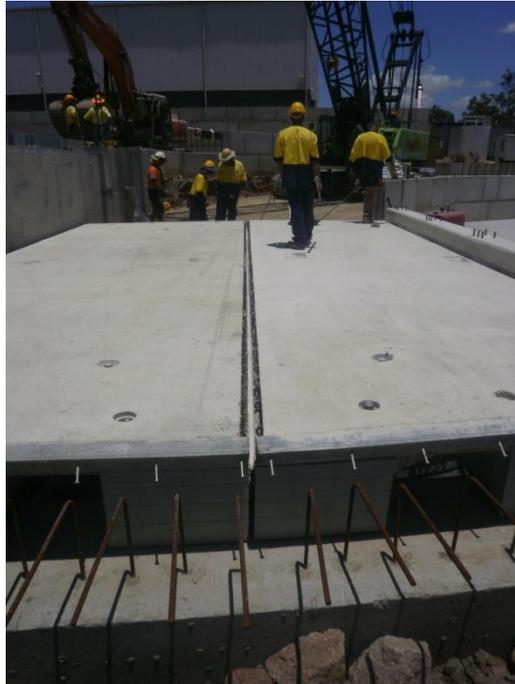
Installation of prefabricated bridge at Murrarie concrete batching plant.
